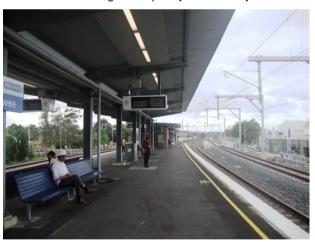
Canopy to west of Platform Building (AECOM, 2016)
